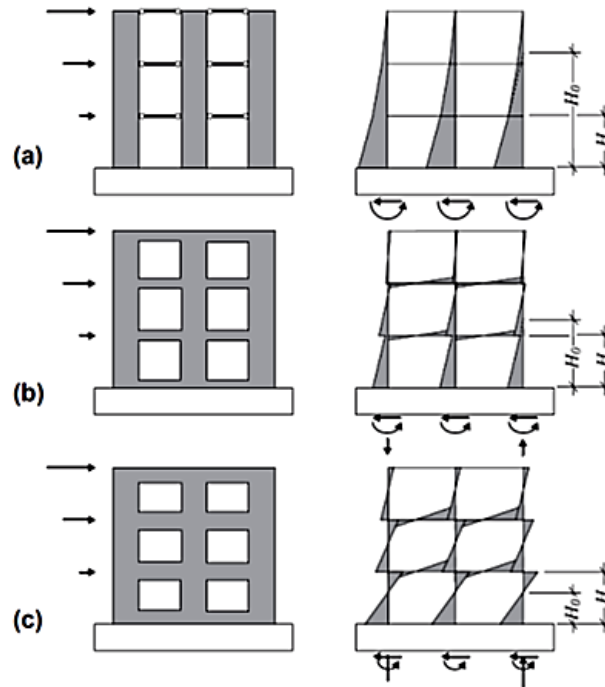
Moment profiles of masonry wall structures with (a) weak coupling, (b) intermediate coupling and (c) strong coupling, taken from [Lang, 2002],[Petry and Beyer, 2014].
